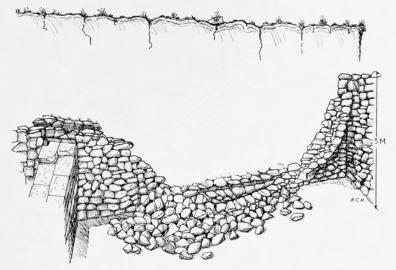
West Wall of the North Room of the Building in YY-ZZ 24-26
